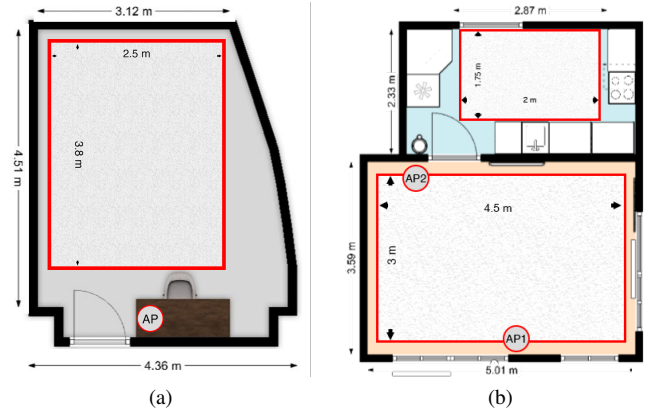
Floor plans used to perform indoor positioning experiments. (a) Lab floor plan with an area of $2.5 \text{ m} \times 3.8 \text{ m}$. (b) Living room (bottom; area $3 \text{ m} \times 4.5 \text{ m}$) and kitchen (top; area $1.75 \text{ m} \times 2 \text{ m}$) floor plans. The access point (AP) locations are marked by circles.
